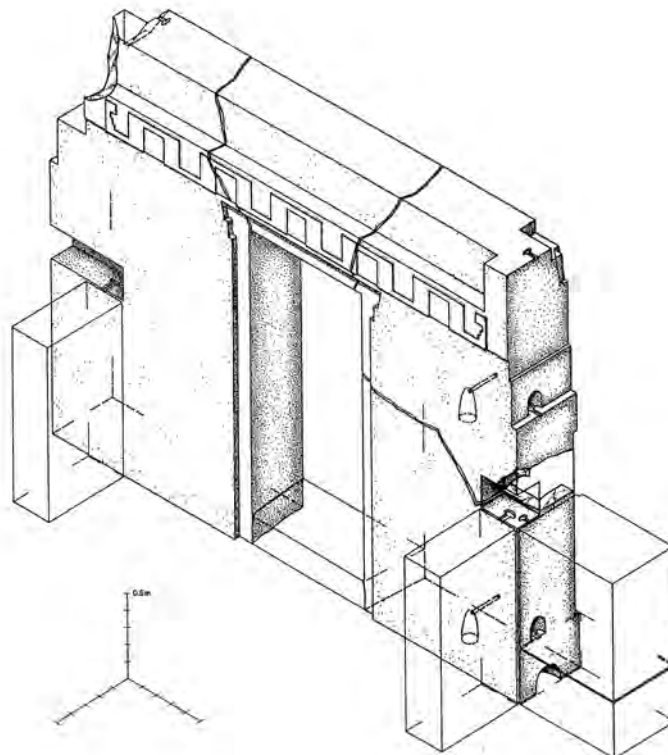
Axonometric drawing of Gateway III showing possible extensions (drawing by Jean-Pierre Protzen).
